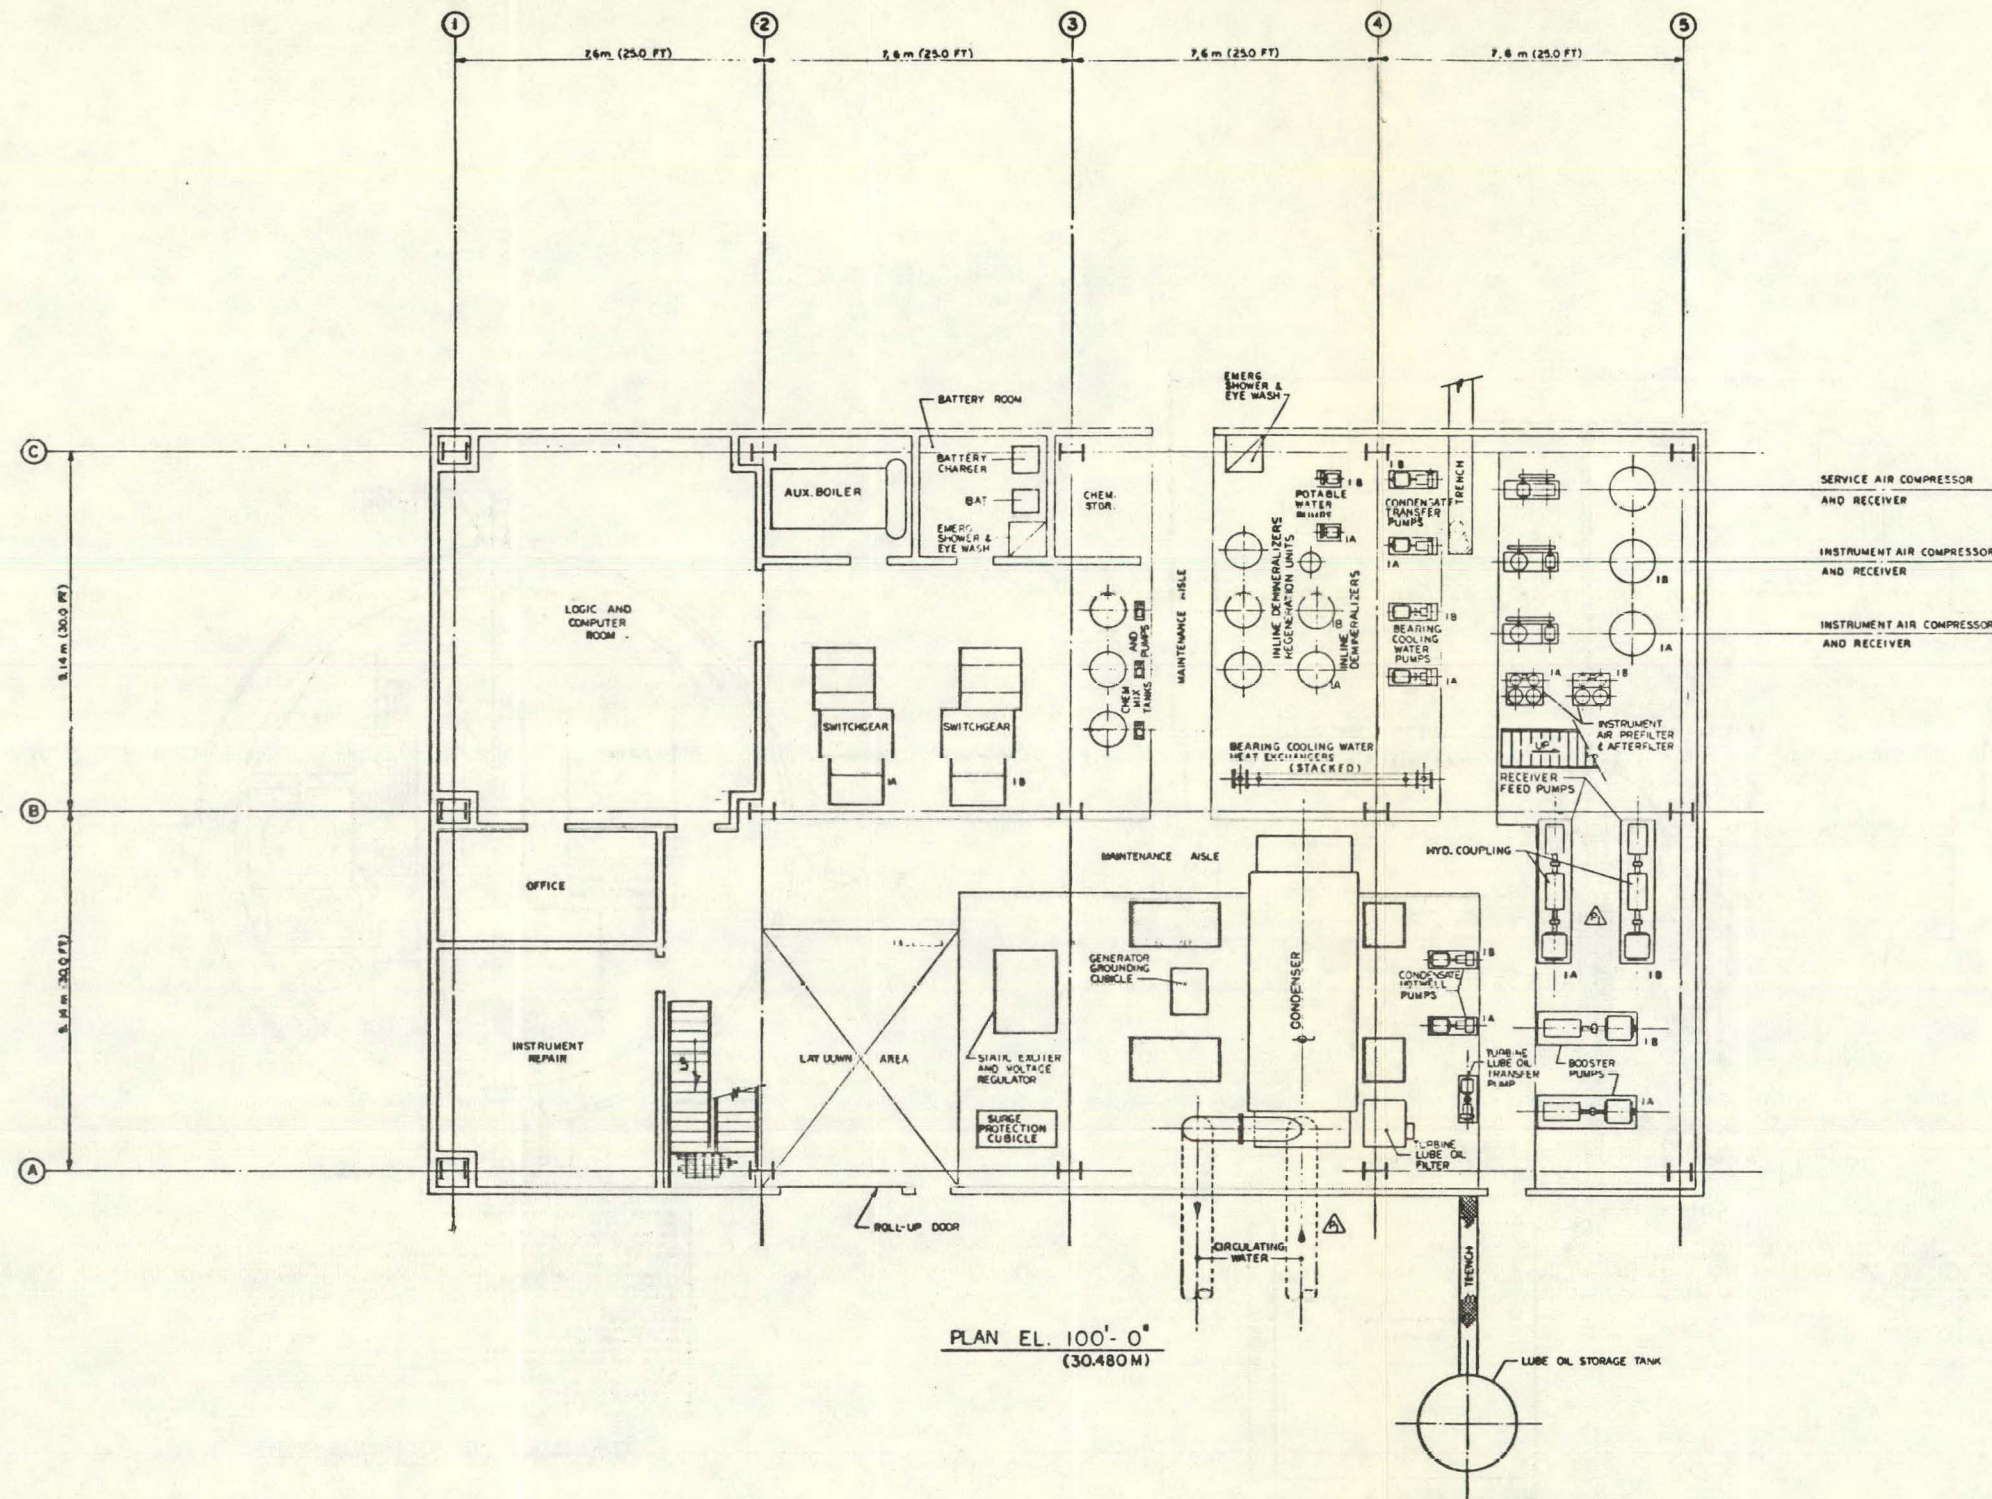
Plot Plan of 10-MW Pilot Plant
